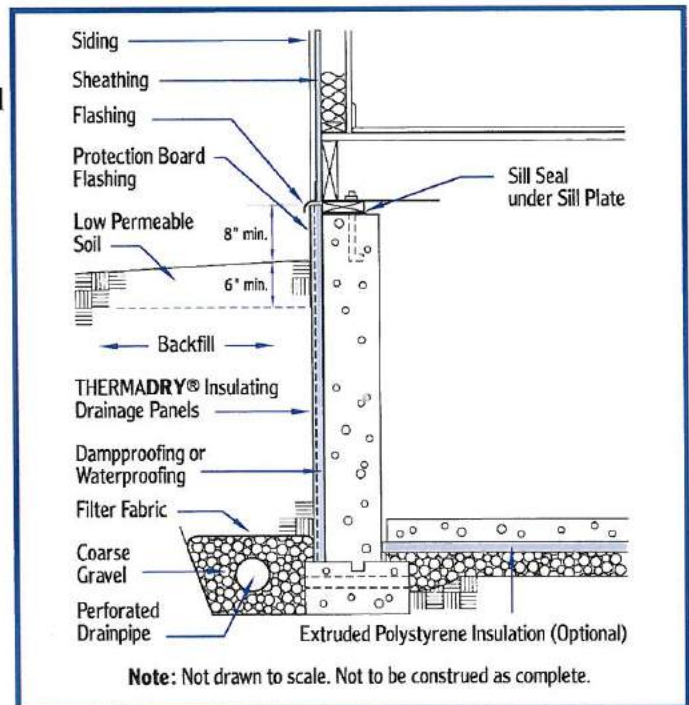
Typical Panel Installation and Connection at Footing Drain Line
